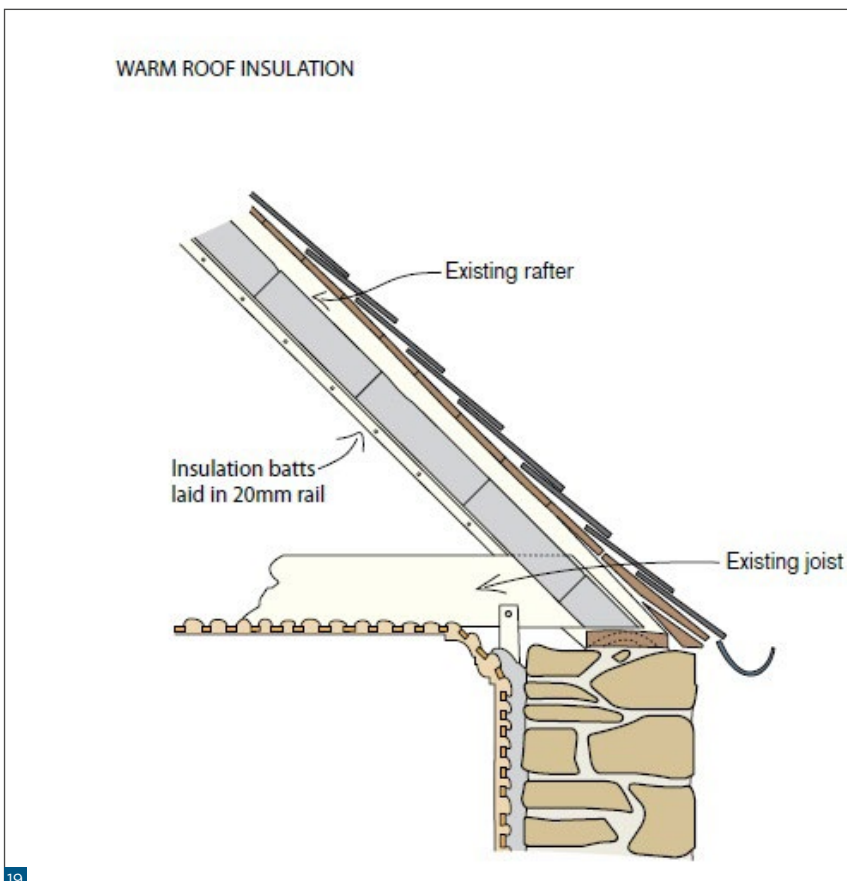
Insulation of roof slopes installed between the rafters, giving a warm roof.
